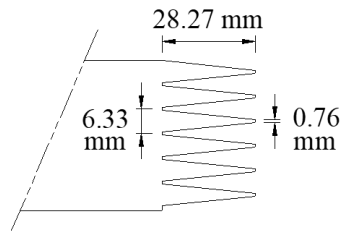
Cross-section showed the FJ specimen geometry dimensions
